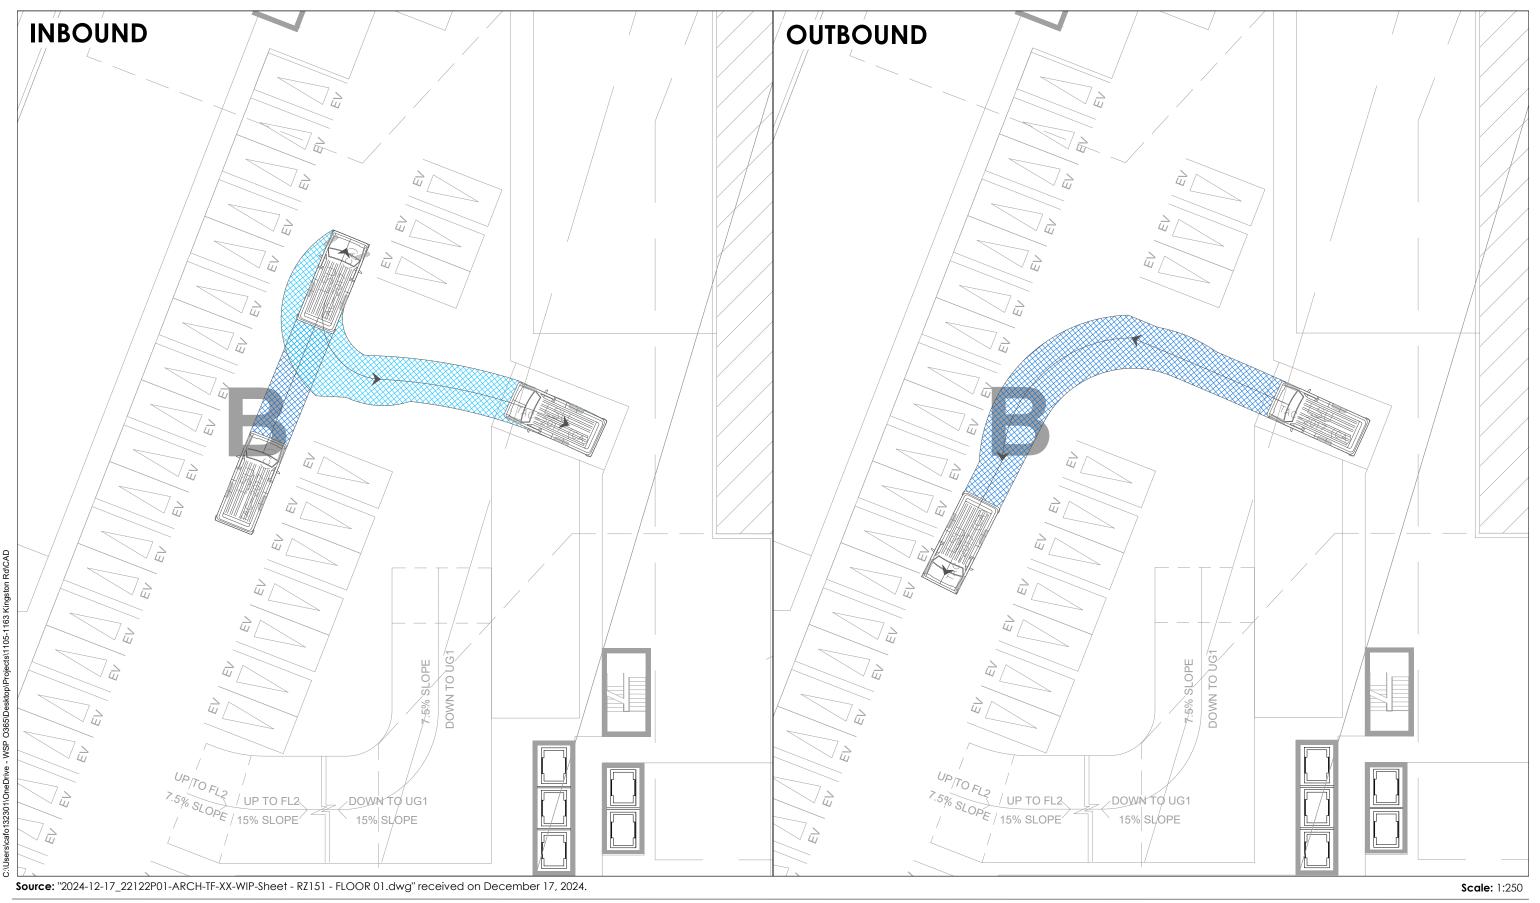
MSU Loading Truck Turning Maneuver - Building E 1105-1163 Kingston Road, Pickering
